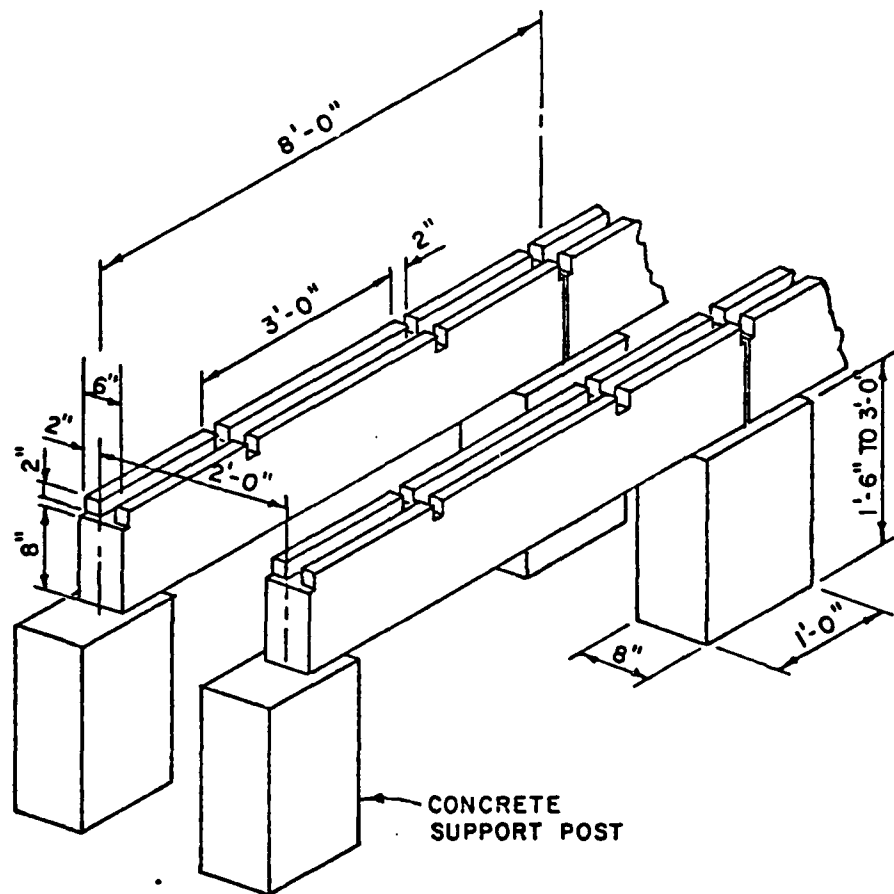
TYPICAL PRECAST CONCRETE BEAM SUPPORT SYSTEM FOR TRICKLING FILTER
